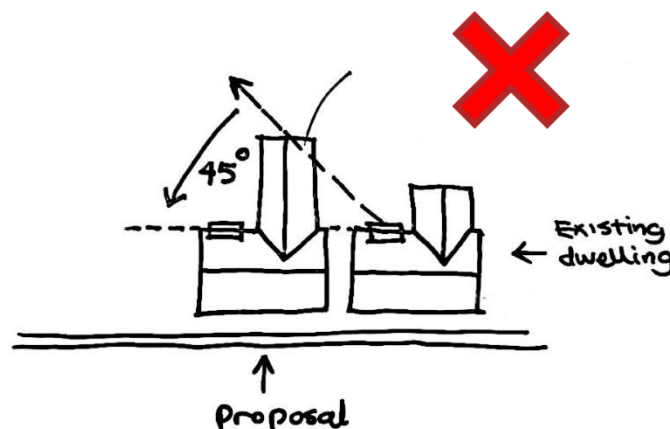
below shows the proposed dwelling crosses the 25° rule for natural light and would not be acceptable.
